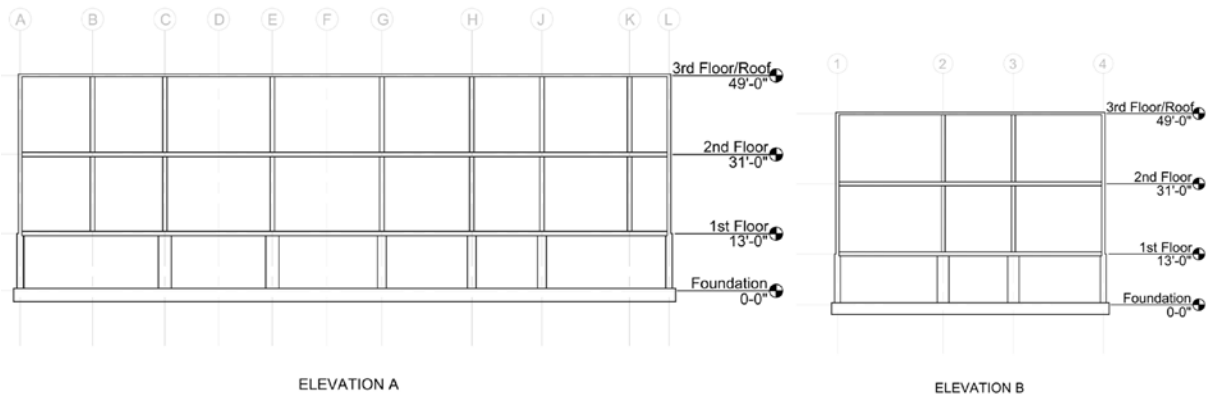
Elevations A and B for Case 1 auxiliary building
